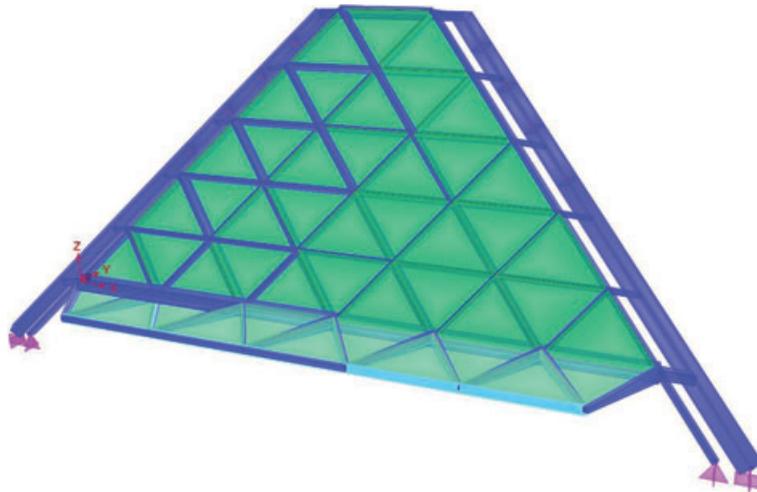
Structural model of atrium structural steel and glass roof enclosure
